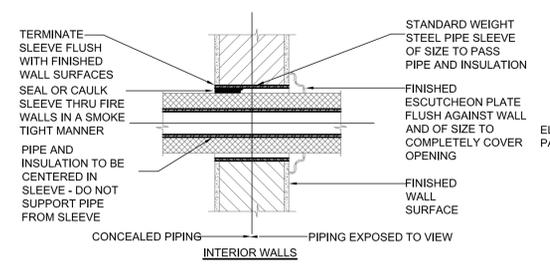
DETAIL OF PIPING PIERCING FIRE RATED PARTITIONS, WALLS AND FLOORS
